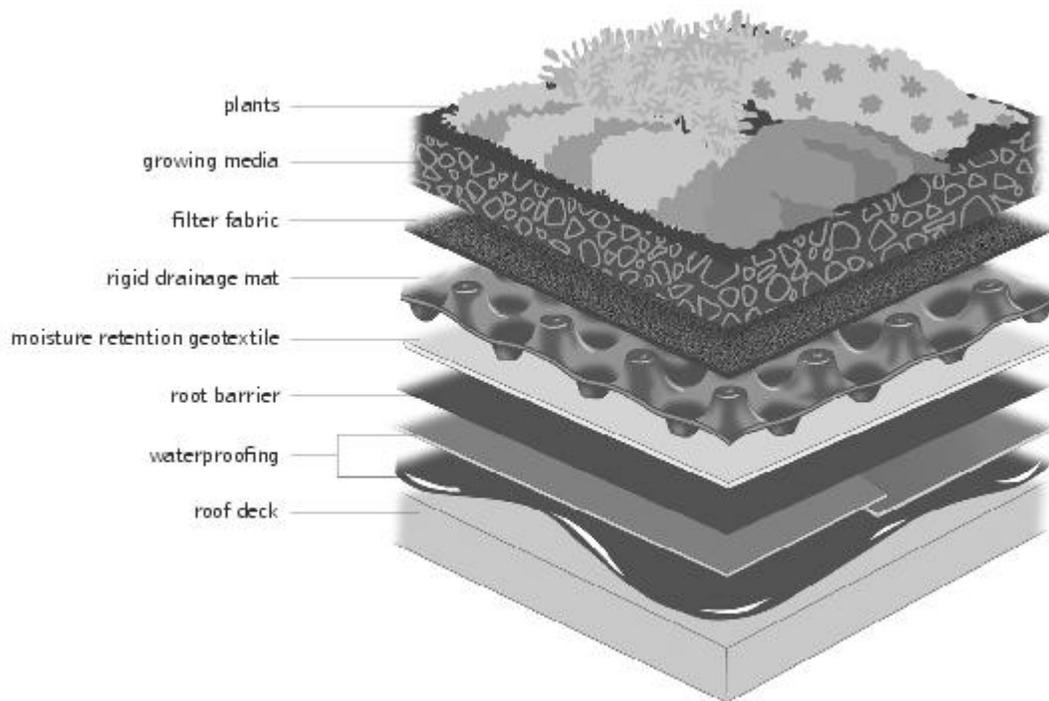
Typical cross-section from an extensive green roof
